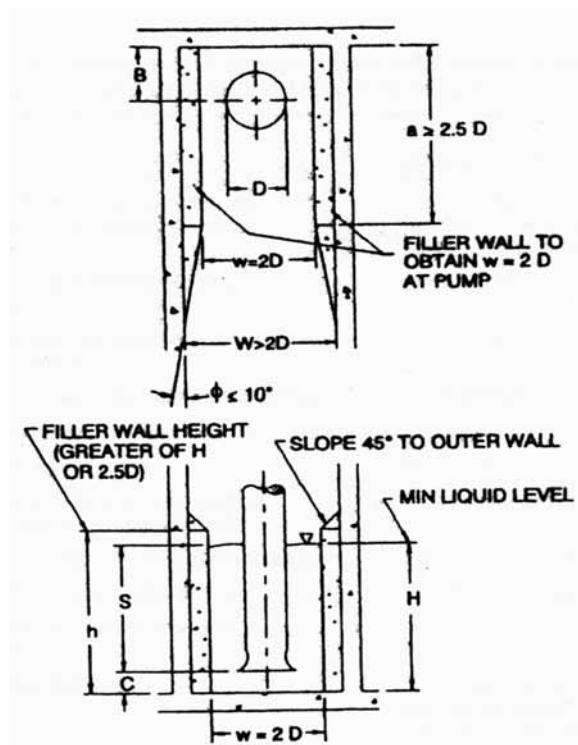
Filler wall details for proper bay width (Source: American National Standard for Pump Intake Design, 1998)
